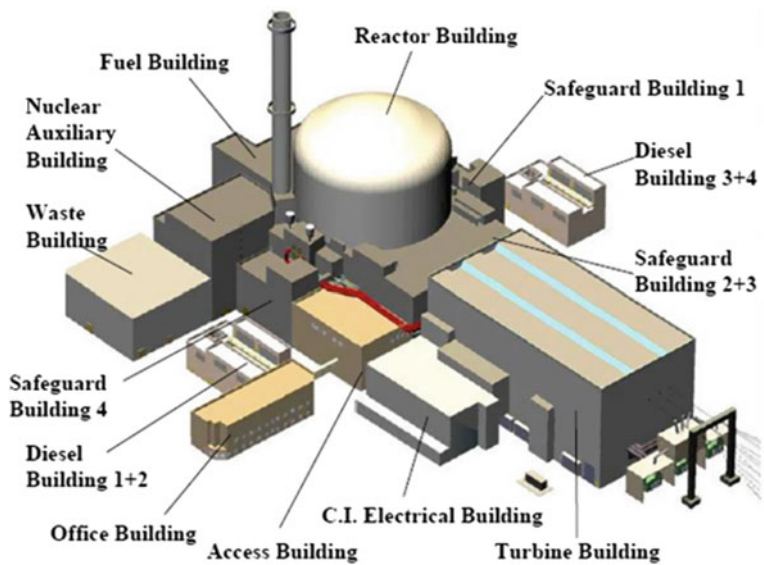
Typical EPR layout. Source AREVA (2008)
